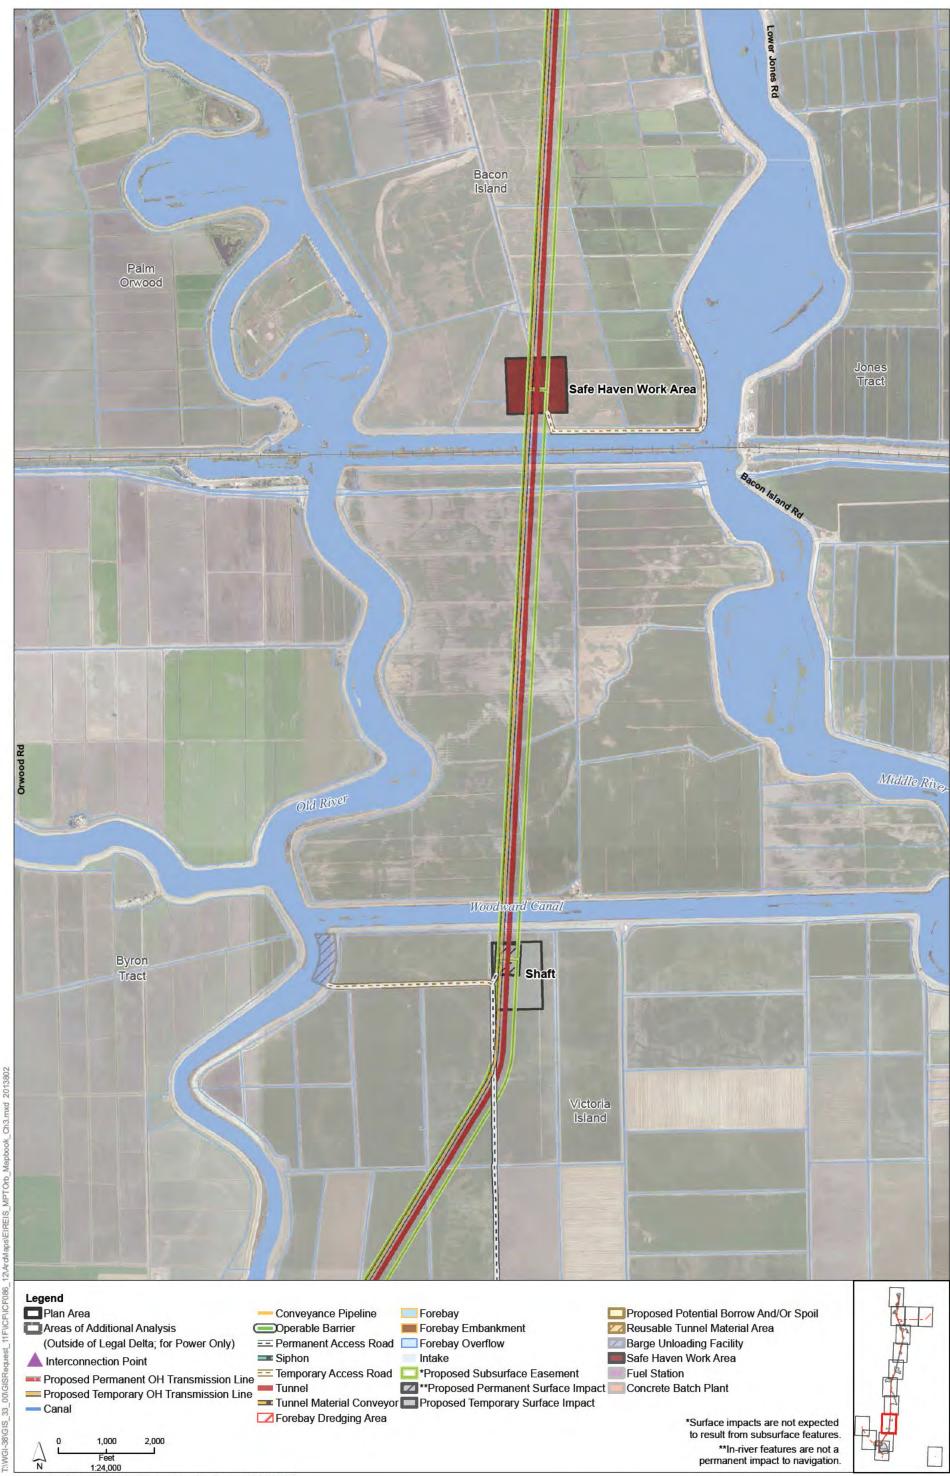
Sheet 8 of 15 Modified Pipeline/Tunnel Alignment (Alternative 4)
